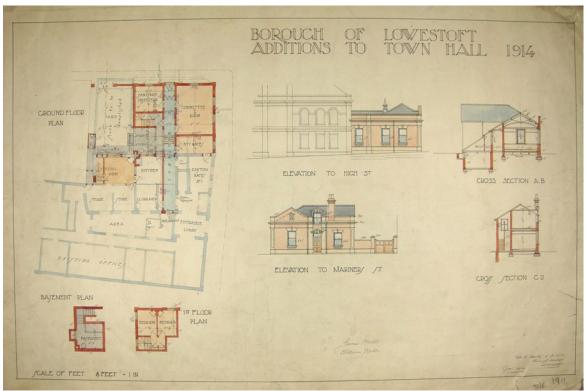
Town Hall extension to High Street 1914, JH Hamby architect (SRO/ESDC)
